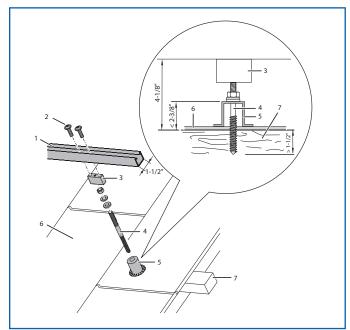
On-site attachment of sleeves for watertight mounting of screws for installation on sheet metal roofs (dimensions in inches)
